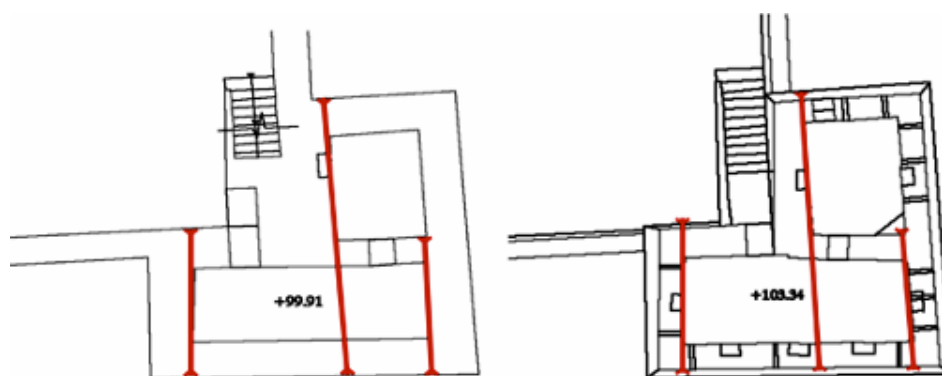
Schematic plans of anchors in South East Tower, Al Muwaiji Fort, UAE.
